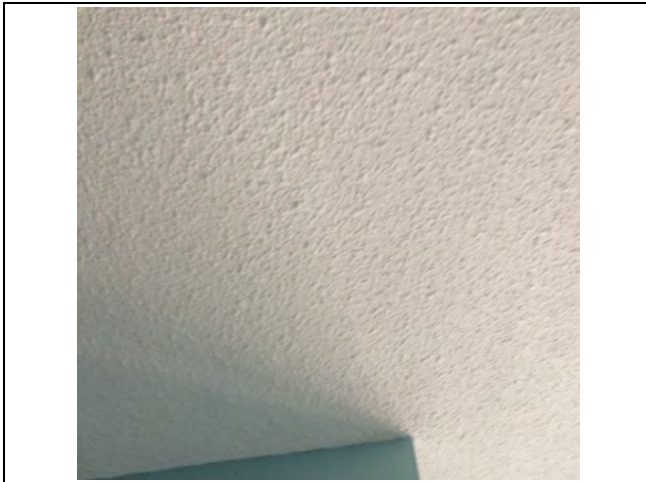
Asbestos-containing stucco (2% Chrysotile) observed to be in good condition on the ceiling in the 1<sup>st</sup> floor stairwell.
